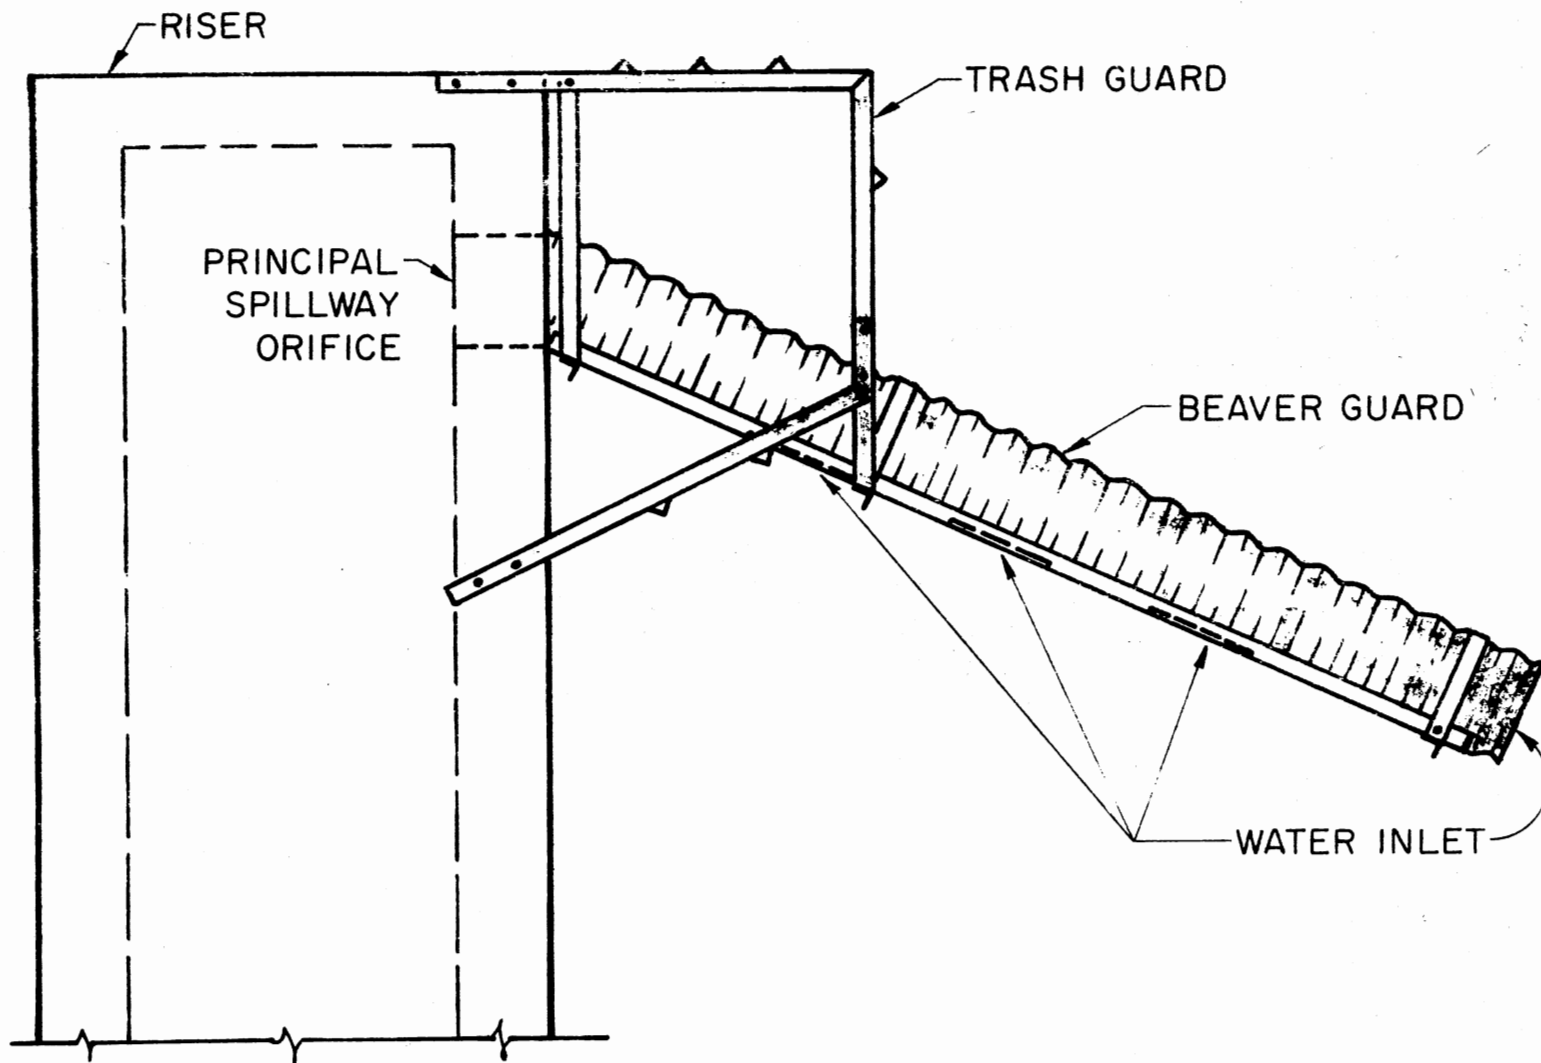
Beaver guard type 7A has not been plugged, although it was installed on a riser which beaver had attempted to plug just prior to installation of guard
